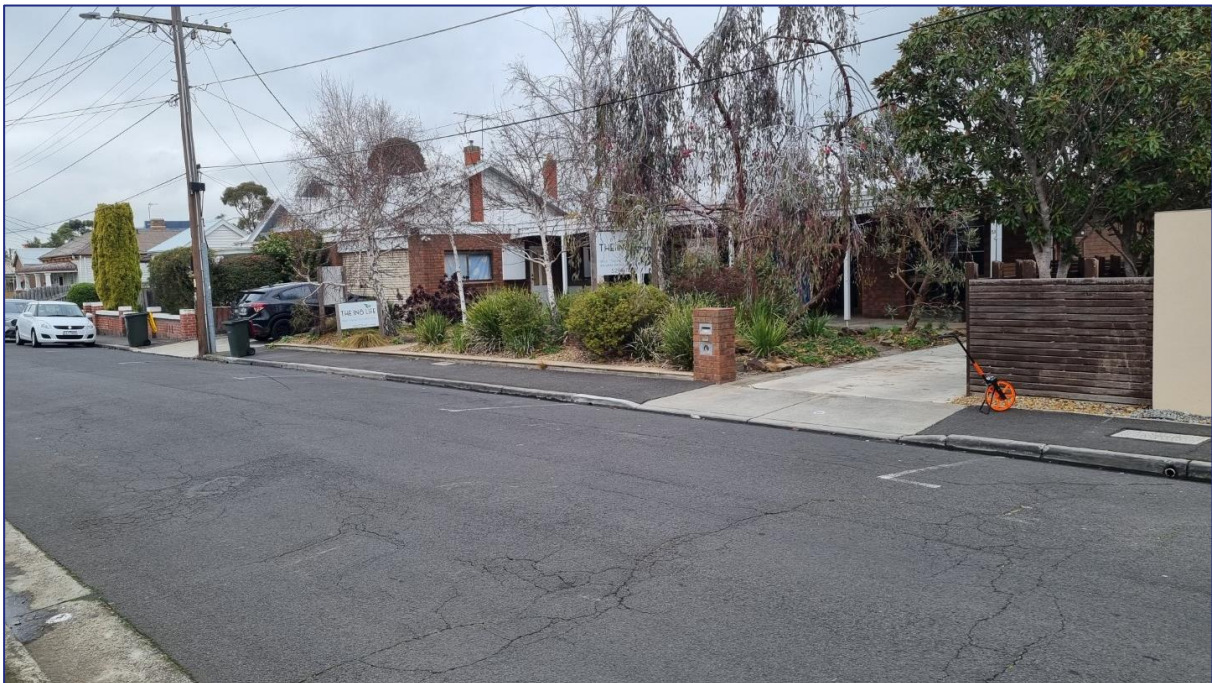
51-53 Hope Street – view south-east from Hope Street
